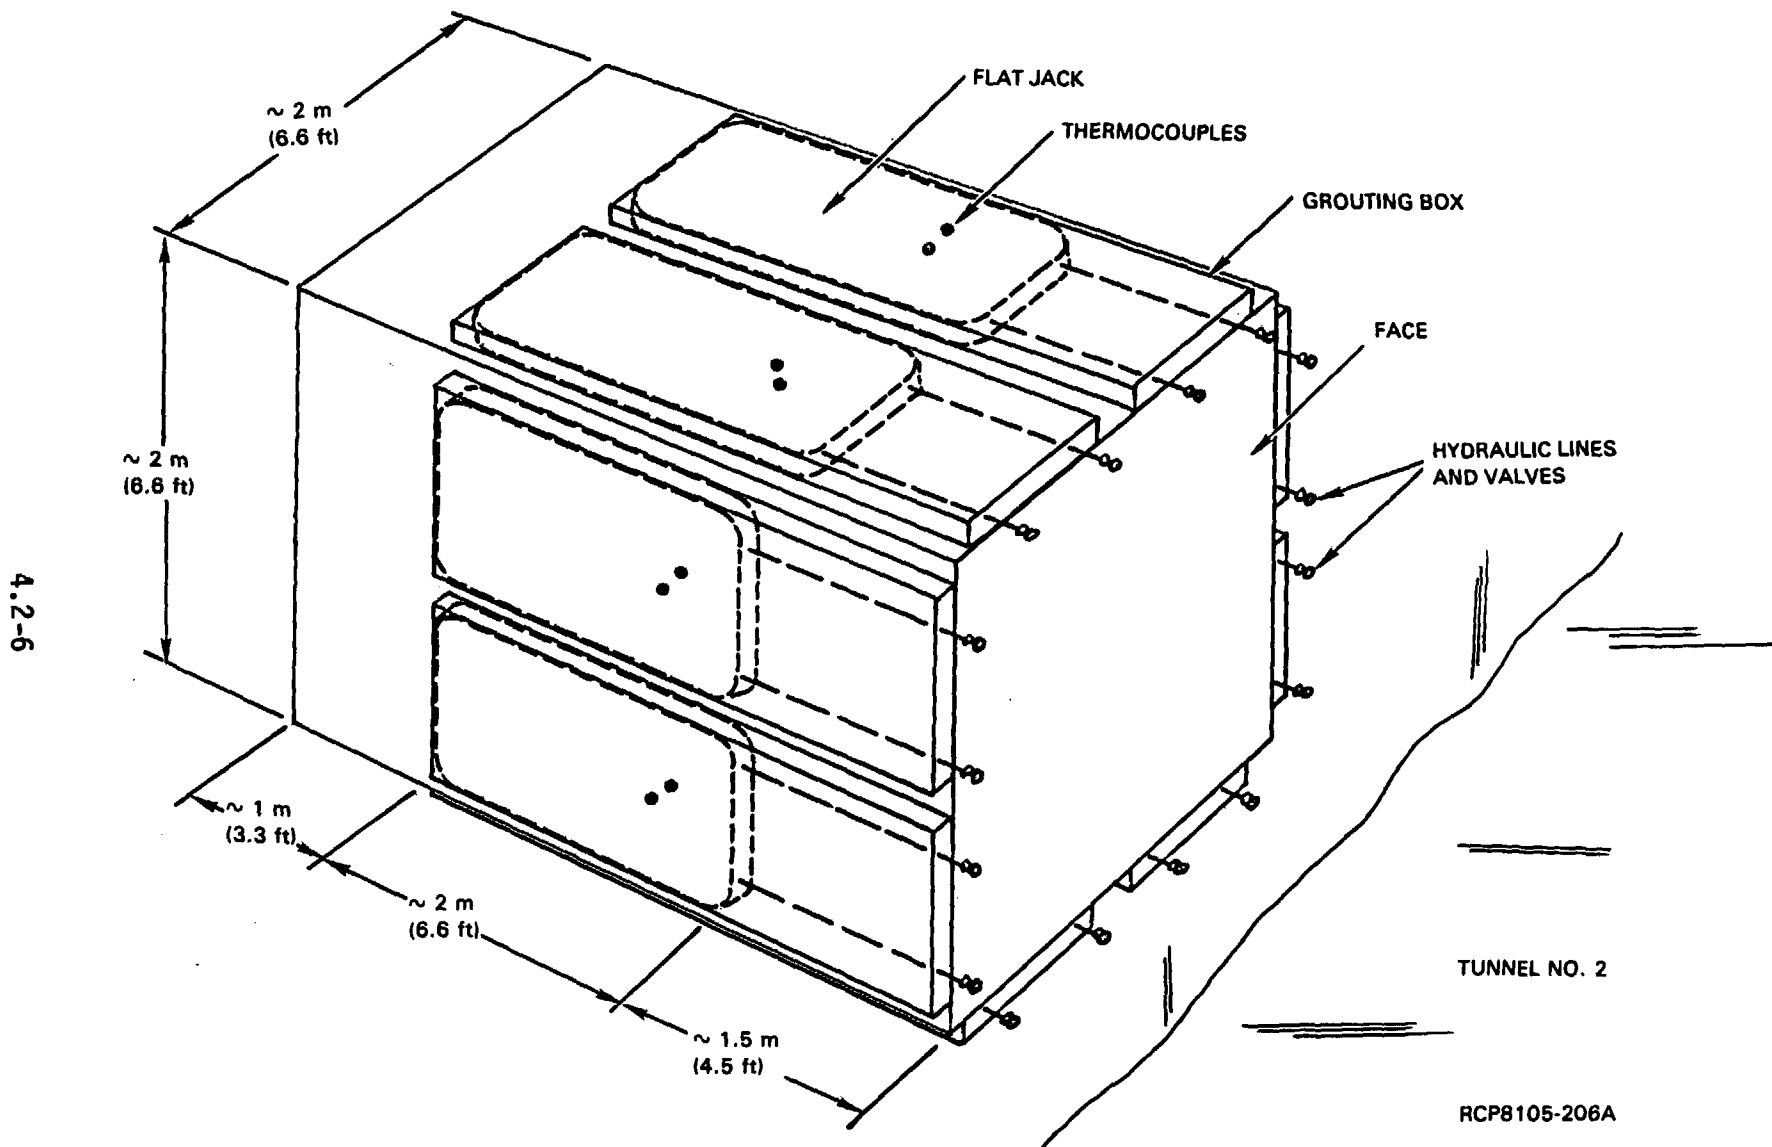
Block Test Number 1 Flat Jack and Grouting Boxes.
